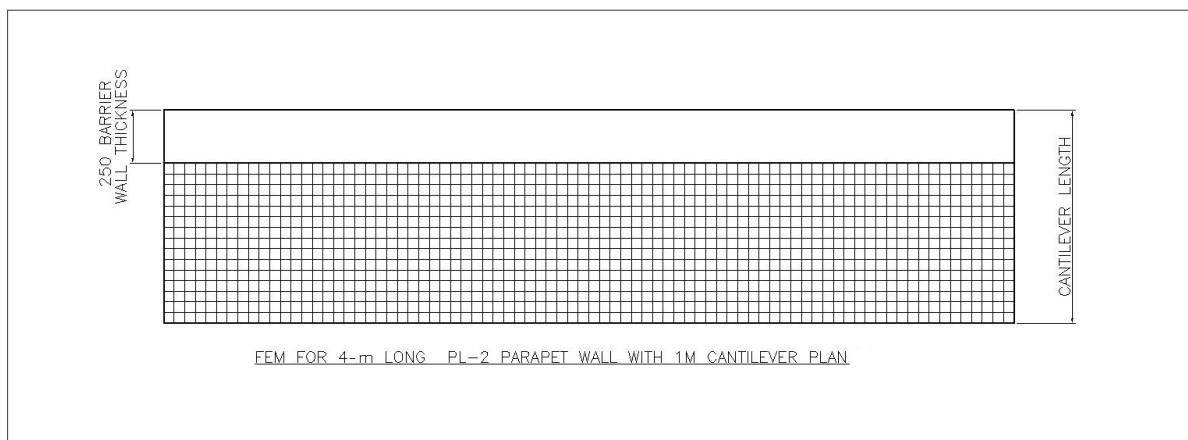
Plan view of the PL-2 Parapet FE Model
